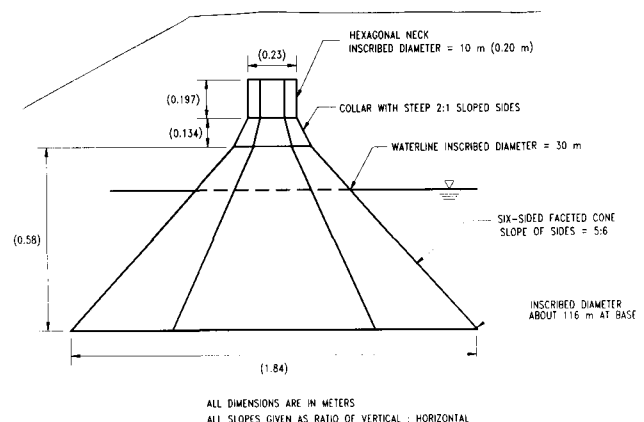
Schematic of faceted cone. Typical full-scale dimensions are shown and actual 1:50 model-scale dimensions indicated in parentheses.
